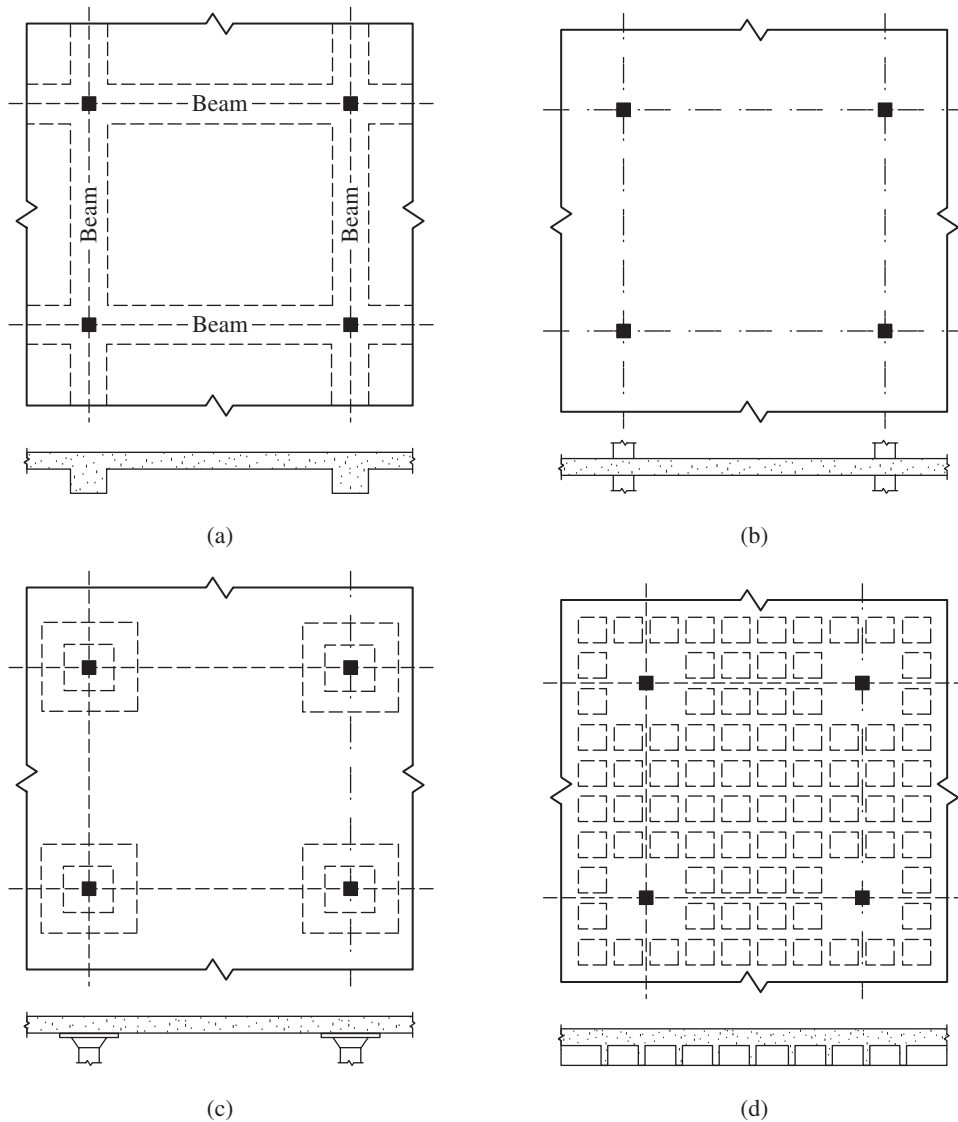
Types of two-way slabs (a) Two-way slab (b) Flat plate (c) Flat slab (d) Grid or waffle slab
